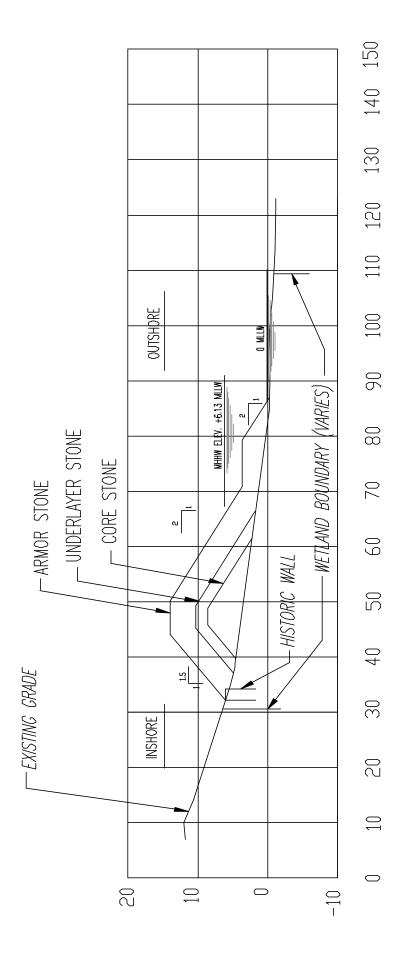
Stone Breakwater at 2:1 slope (Typical Cross-Section).
